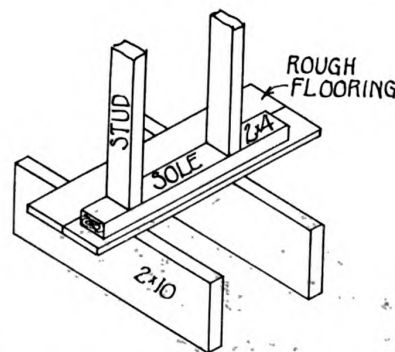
Usual method of running partitions at right angles to joists. It should be remembered that in this case the joists bear a concentrated load, which is more destructive than a distributed load.
